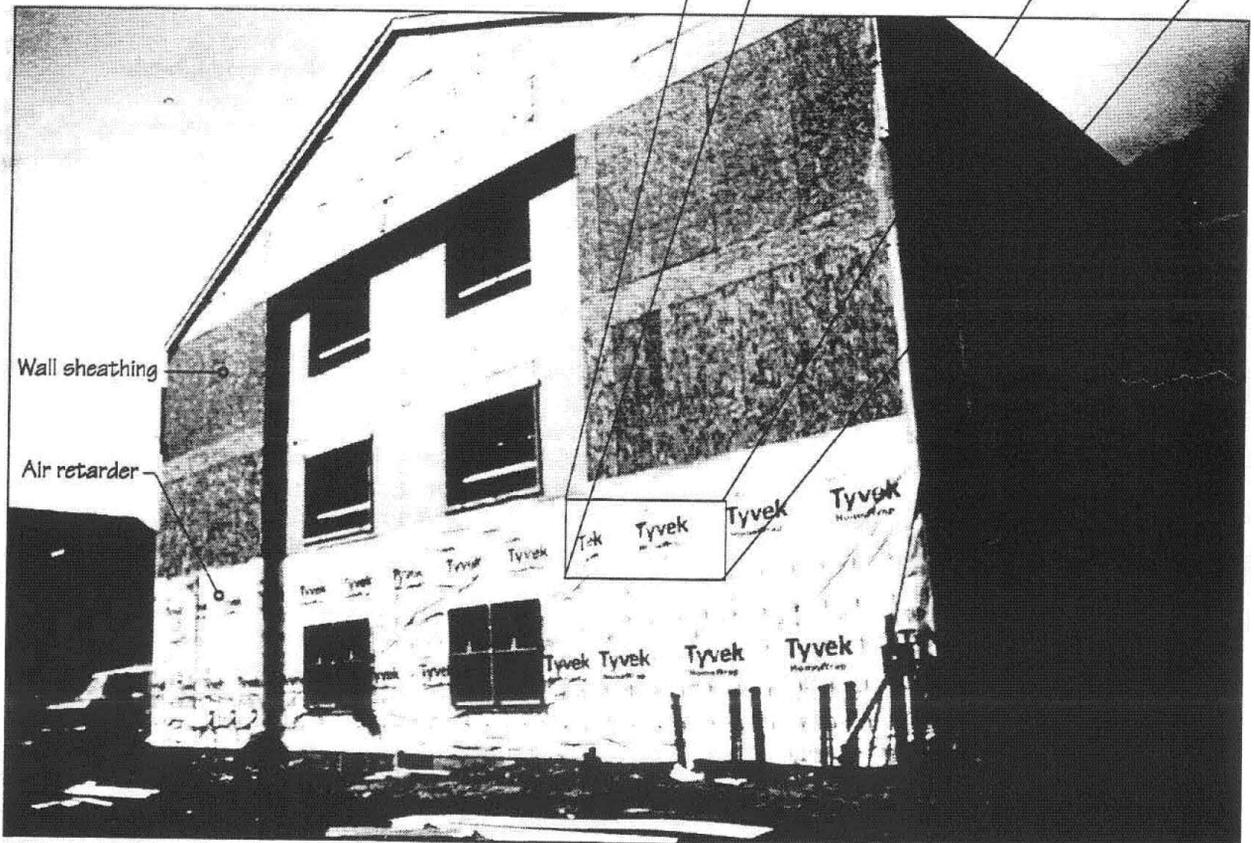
An air retarder wrapped over the exterior wall sheathing of a 3-story wood frame apartment building.
